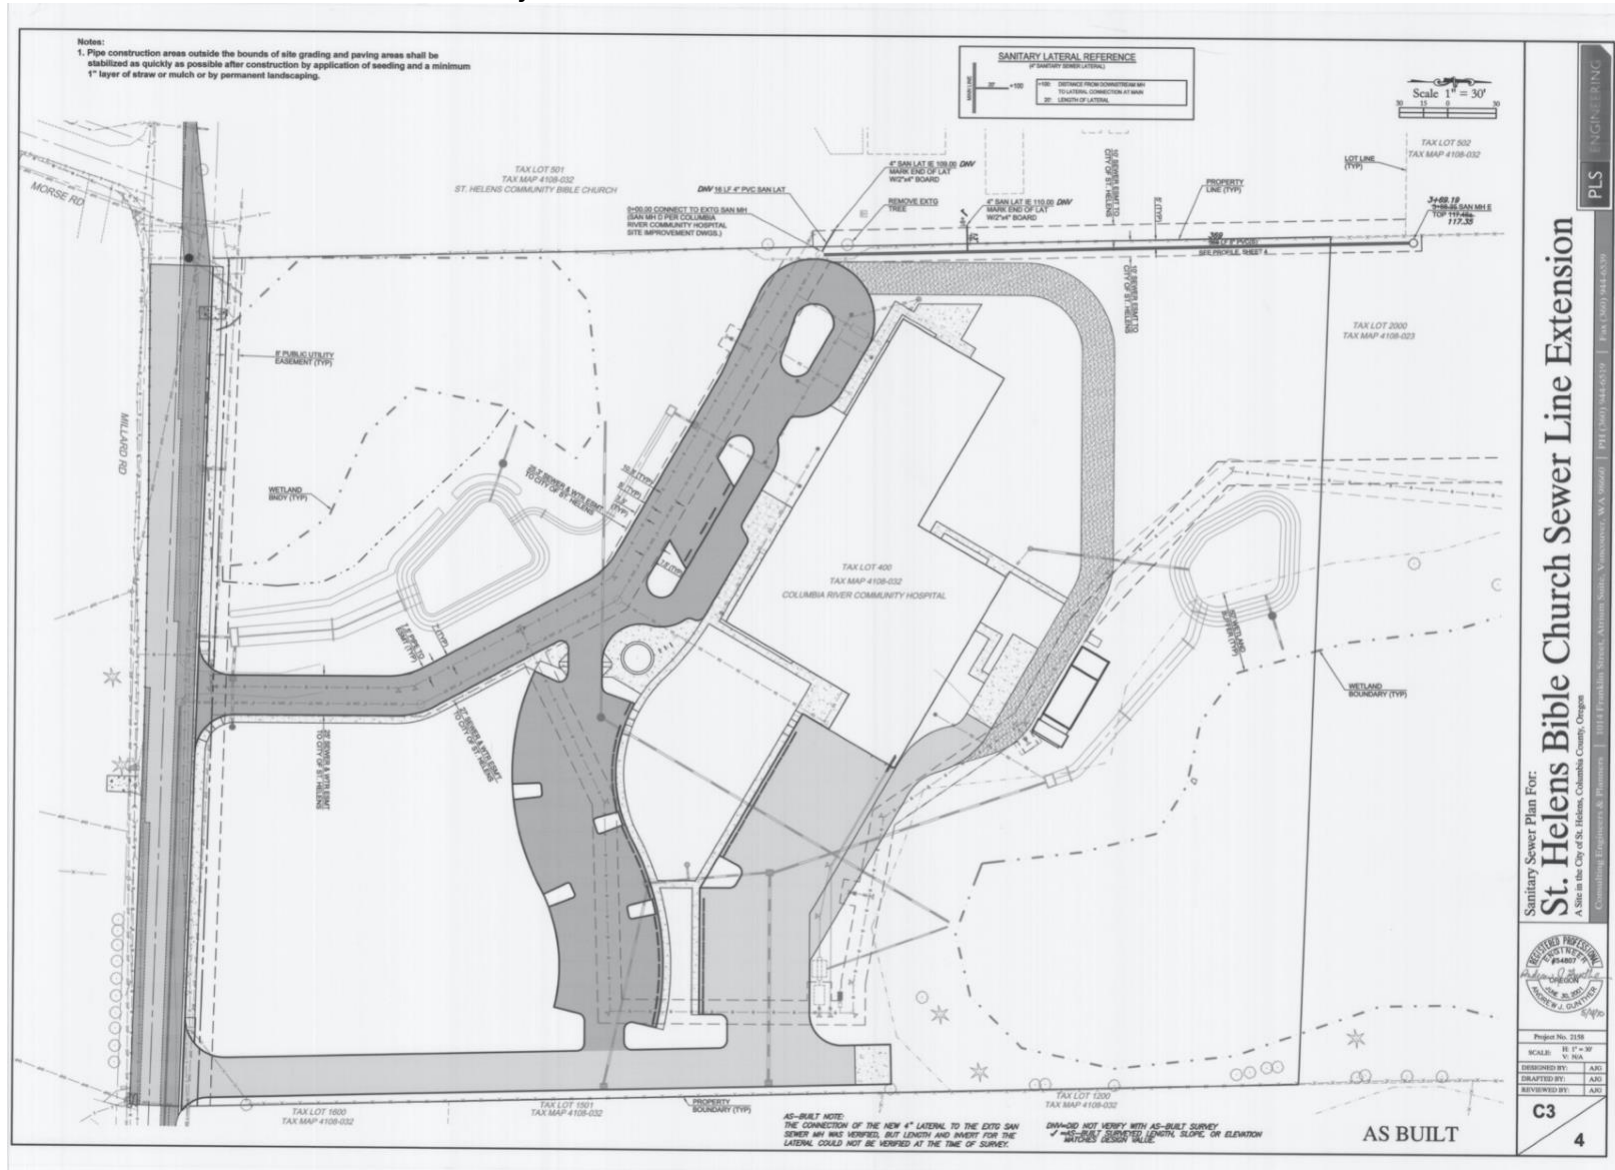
St. Helens As-Built Sanitary Sewer Line Extension
